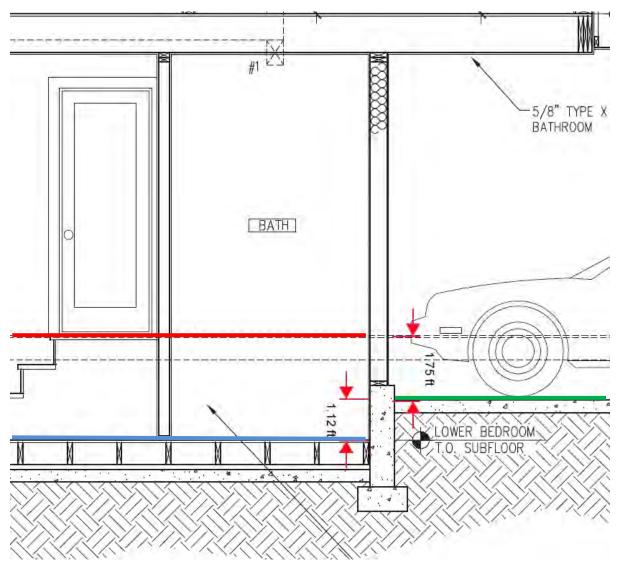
Detail of first-floor residence section with areas of differing elevation identified by red, green, and blue lines to match Figure 1, as well as elevation measurements indicated by red arrows.
